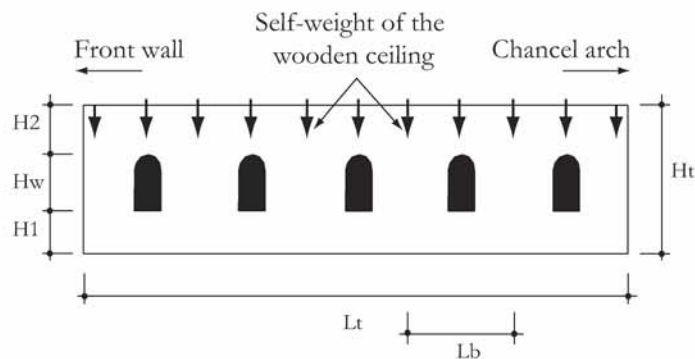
Loading configuration of lateral wall LW2 without abutments.
